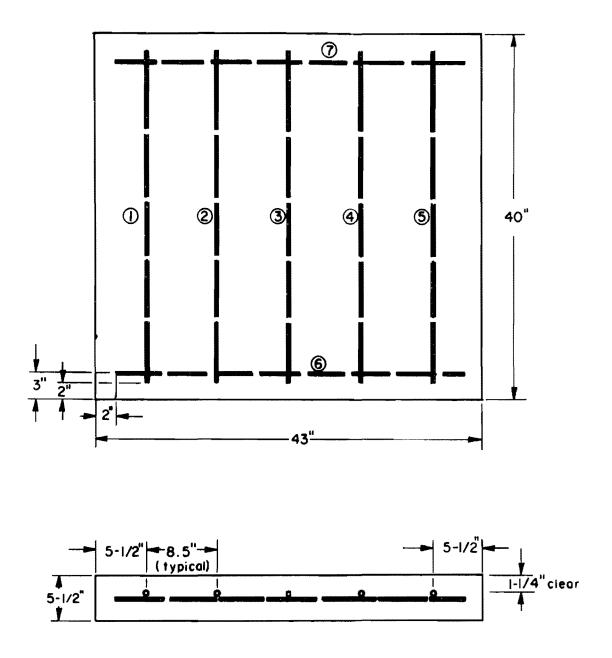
Arrangement of No. 8 reinforcing bars in test slabs.
